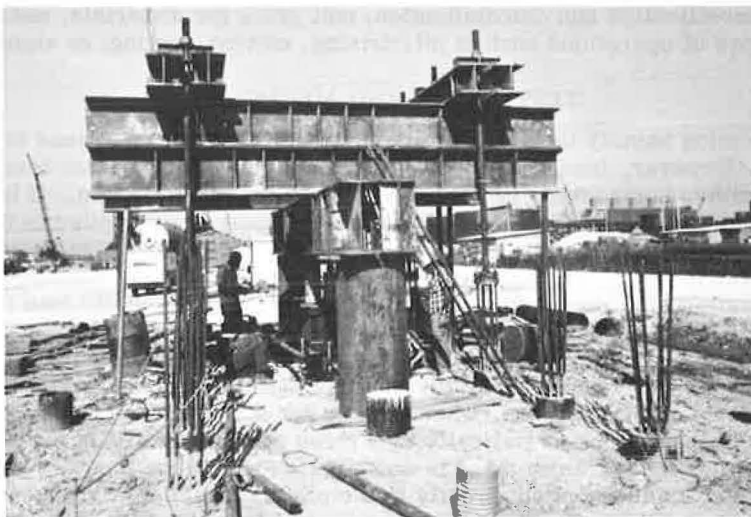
Test load applied to pile with hydraulic jack reacting against a test frame and anchor piles.
